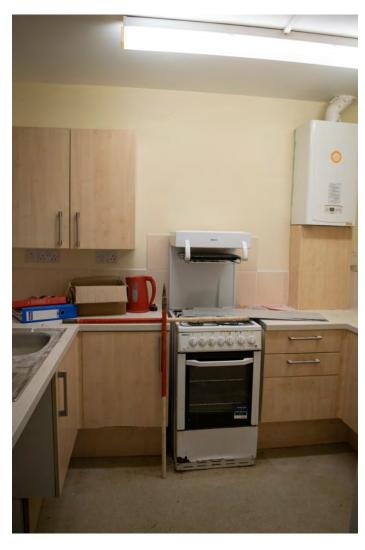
West facing wall of kitchen in flat 1 showing modern kitchen features. 2x1m scale.
